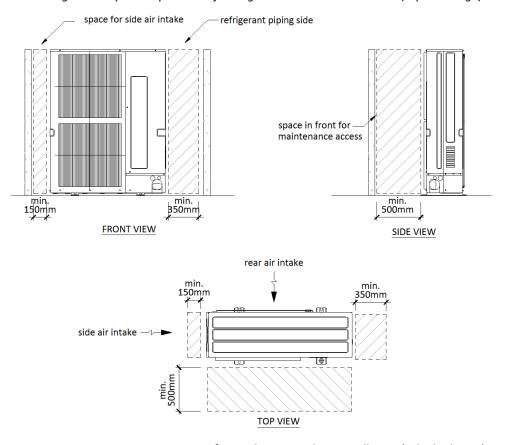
Space requirement for single VRF outdoor installation (side discharge)
